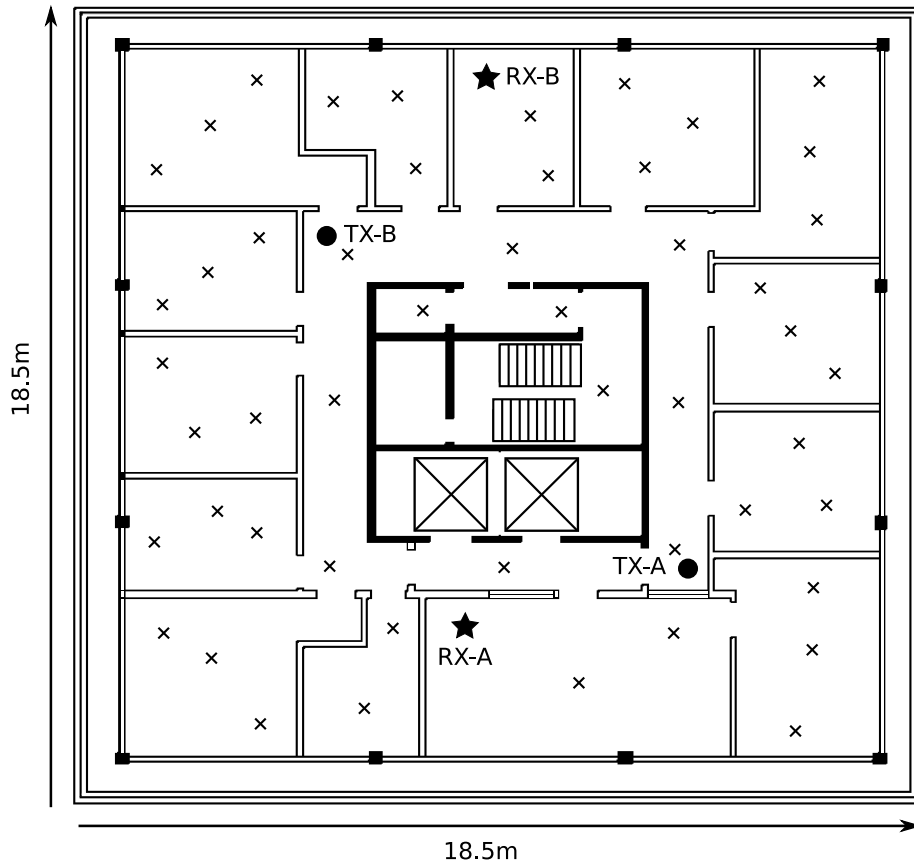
Floor plan of the Engineering School Tower 8th floor. Potential BTS locations are TX-A and TX-B and potential MT locations are RX-A, RX-B, and locations marked 'x'.
